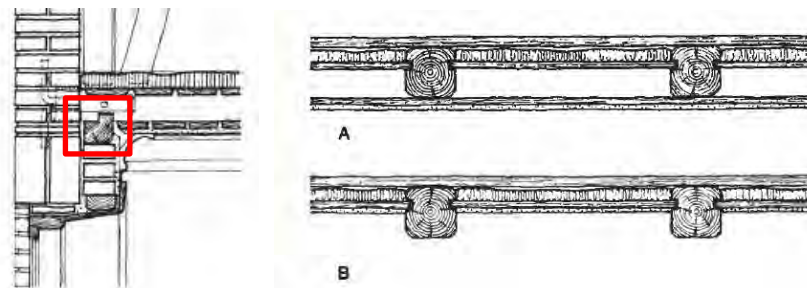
Joint between external wall and floor joist supported by a wall plate (marked by red box) (left). Cross-section of floor joists in normal floors (right, A) and above basement (right, B) (Engelmark, 1983).
